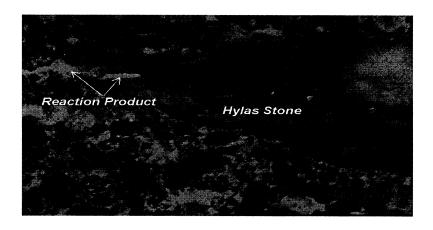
Polished slab from core of damaged I-295 pavement.
